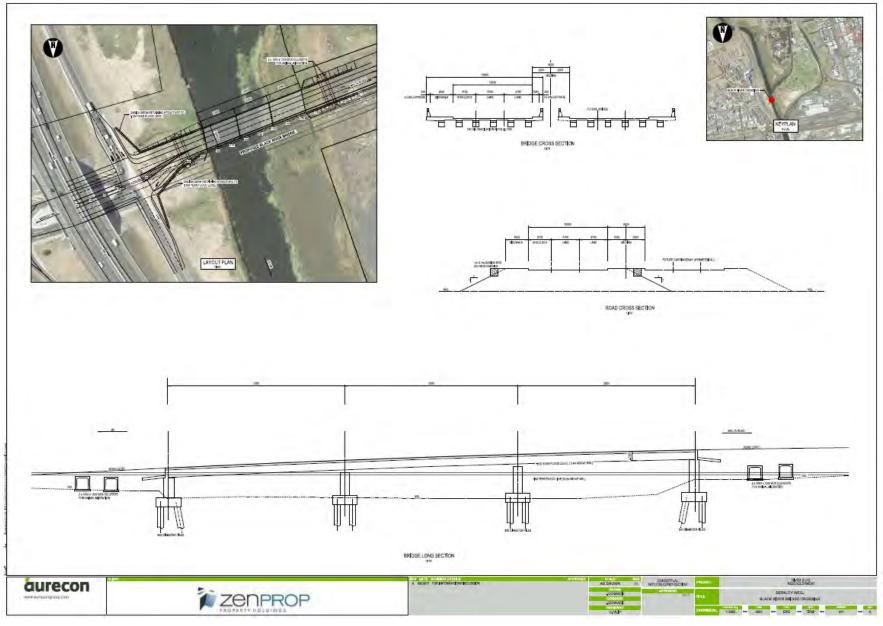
Design and Layout of proposed Berkley Road bridge over the Black River. Figure supplied by Aurecon
